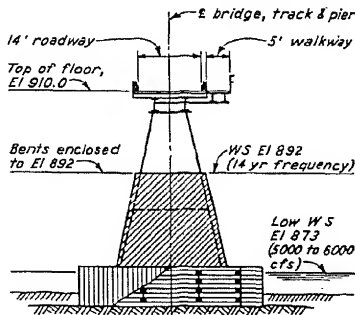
Typical section through highway and railroad access bridge.
